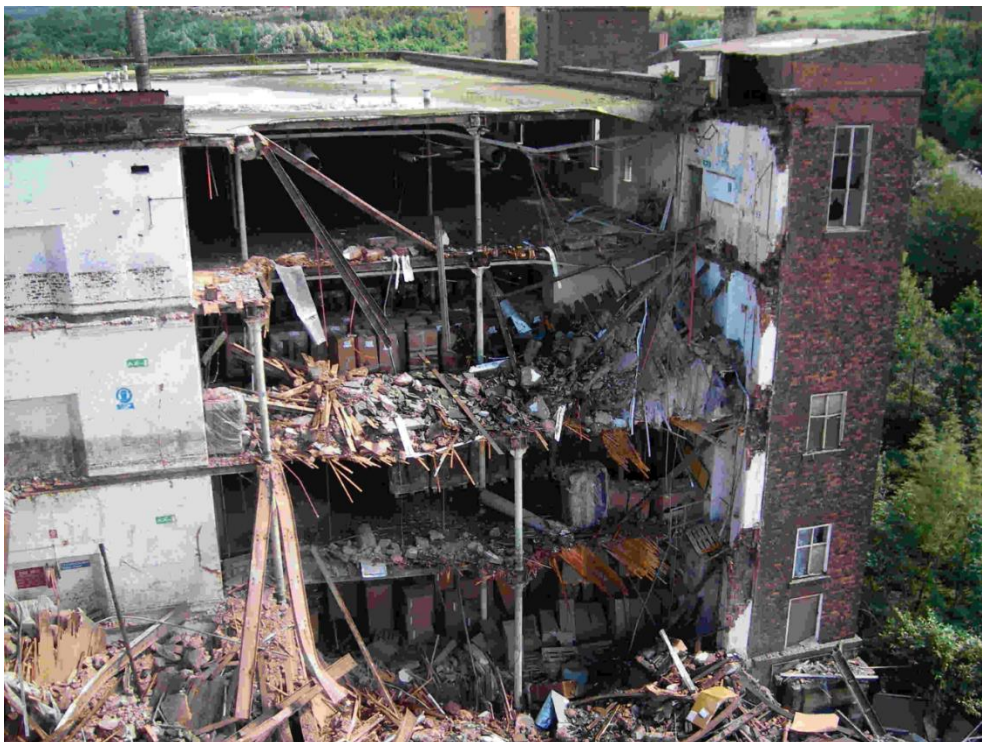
progressive collapse of mill building from (Structural Safety, 2013)
